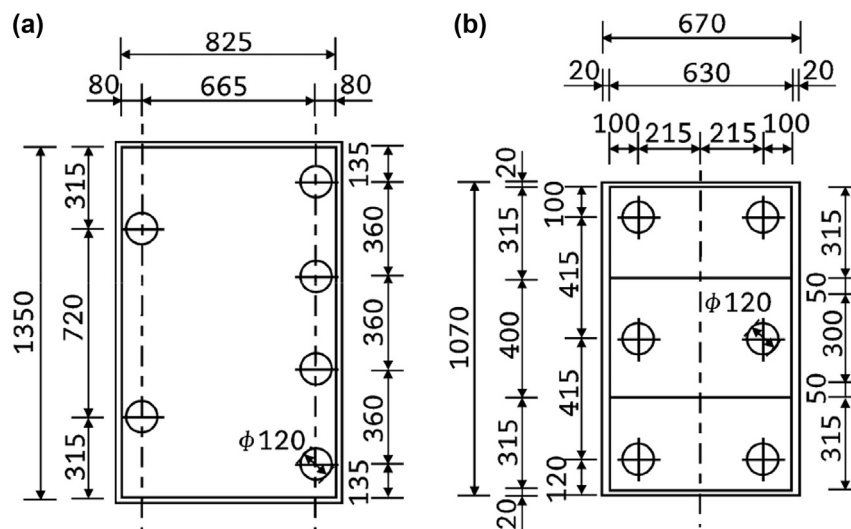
Plan view of piles arrangement at abutments and pier footings (cm). (a) South abutment (symmetric in north). (b) Pier footing.
